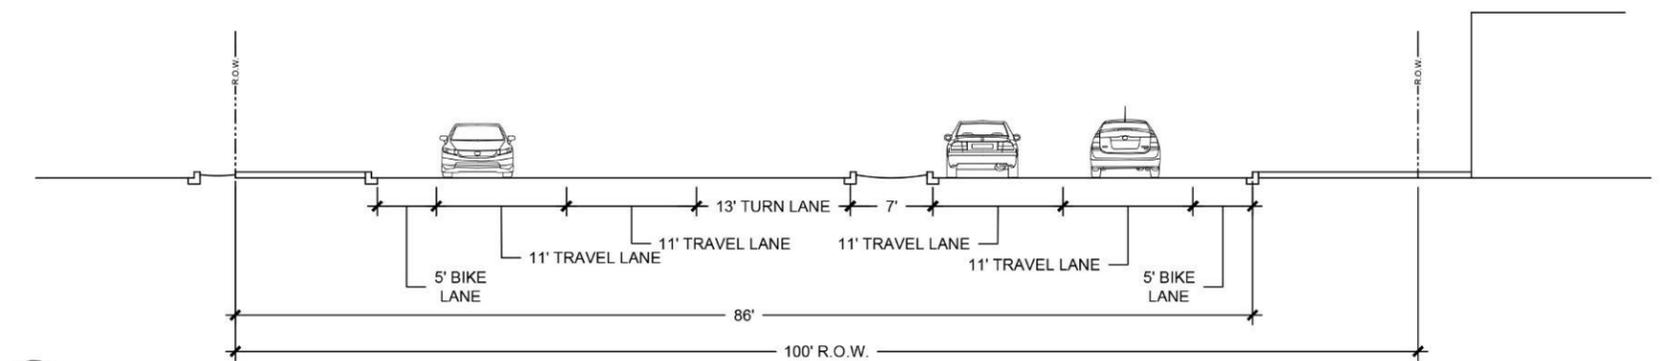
b: Rights-of-Way Cross-Sections
